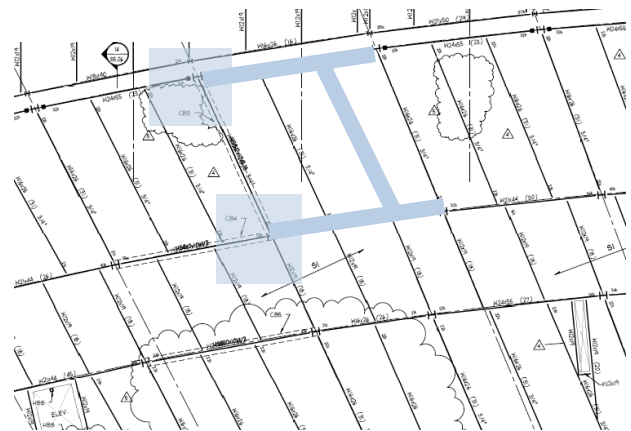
TYPICAL BAY USED FOR SPOT CHECKS
